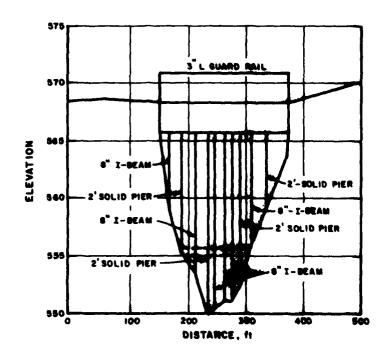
Channel Cross-Section, HSSM 2.4
